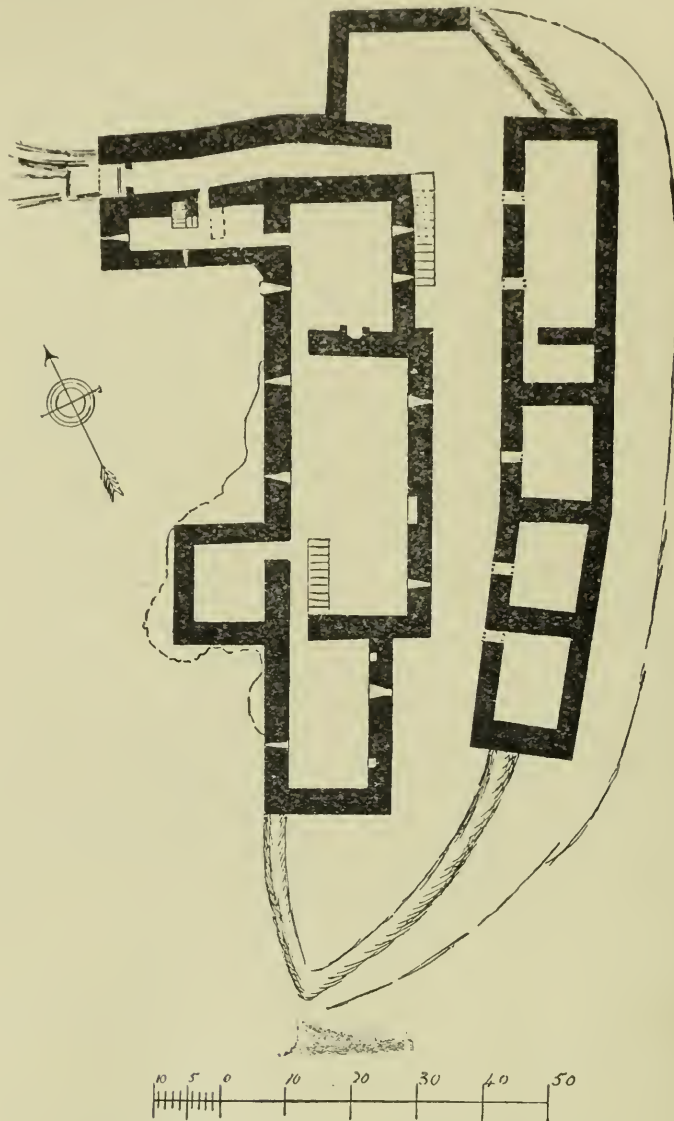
Bucholie Castle (No. 32); Ground-plan.
